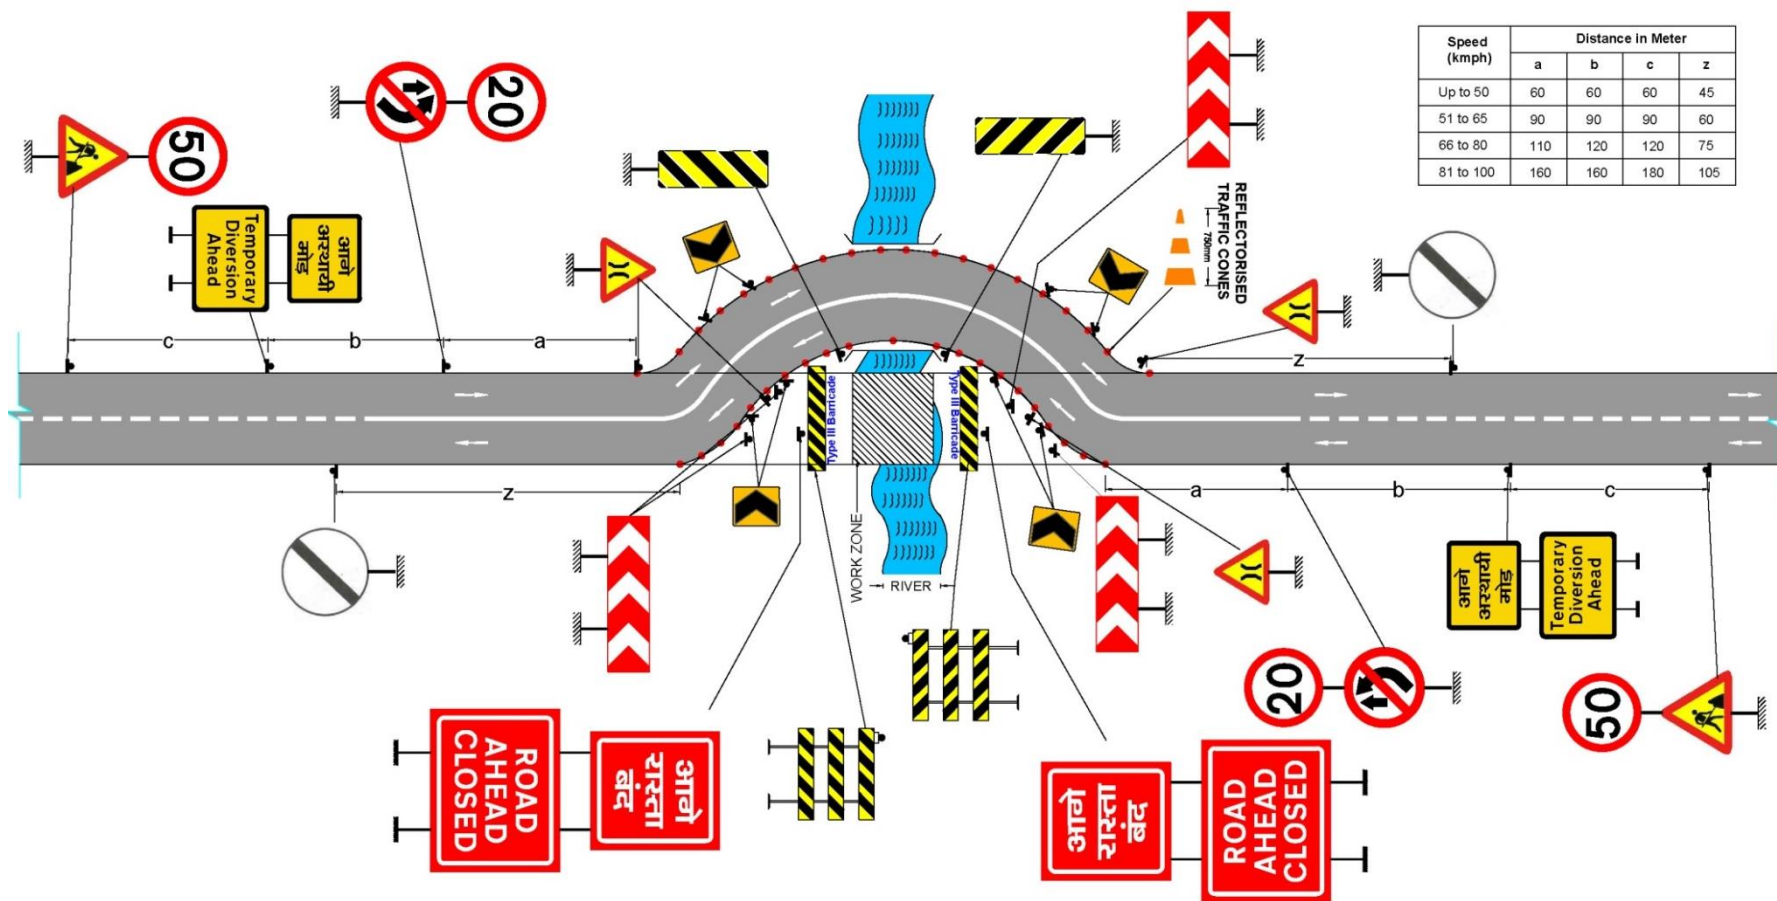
Temporary Diversion for Reconstruction of CD Works
